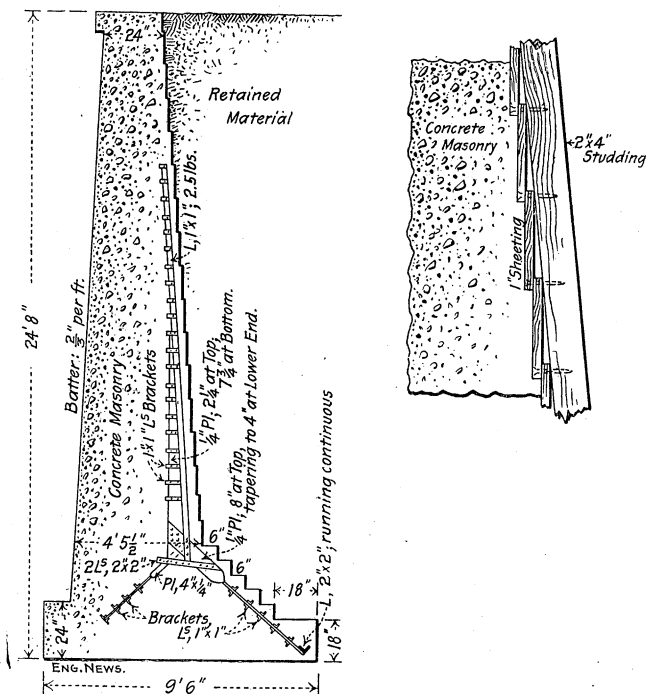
Section of Wing Wall, Bone's System, Constructed at Black Lick, Ohio.
